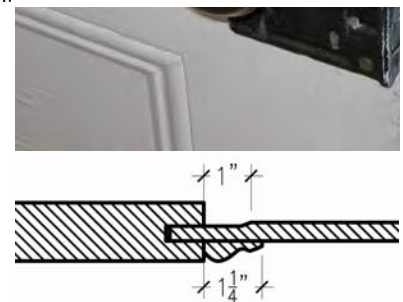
Door D303B molding type-8. (Photo: BBB, 2007)
